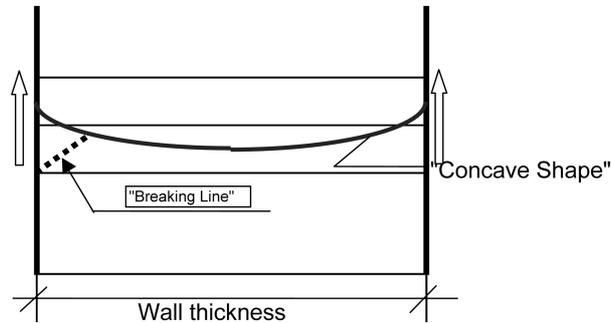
“Concave shape” of the concrete “hardened front” in the slipforms
